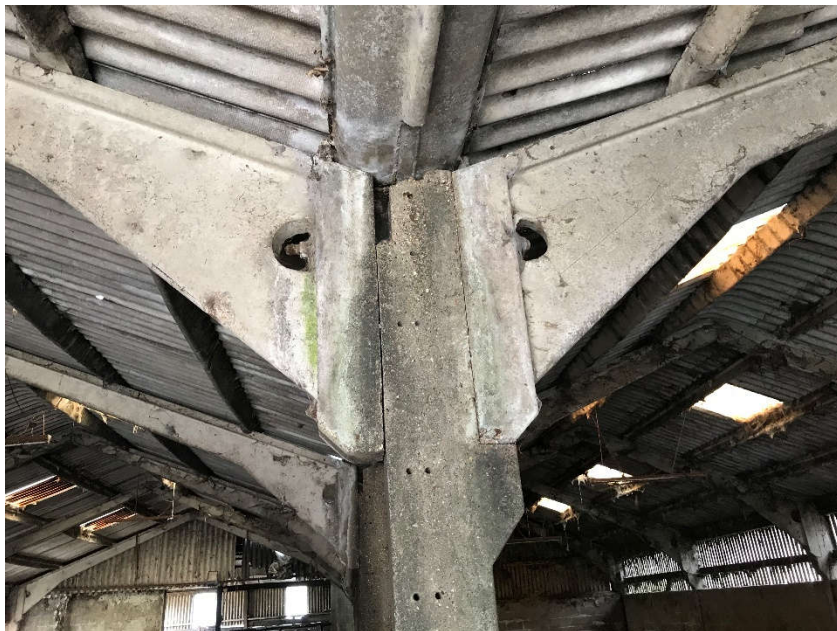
Shed 2 is a later addition which is evident from the construction of the concrete portal frame which attaches (left) to the original portal frame of Shed 1 (on the right) which runs along the centre-line of the building.
